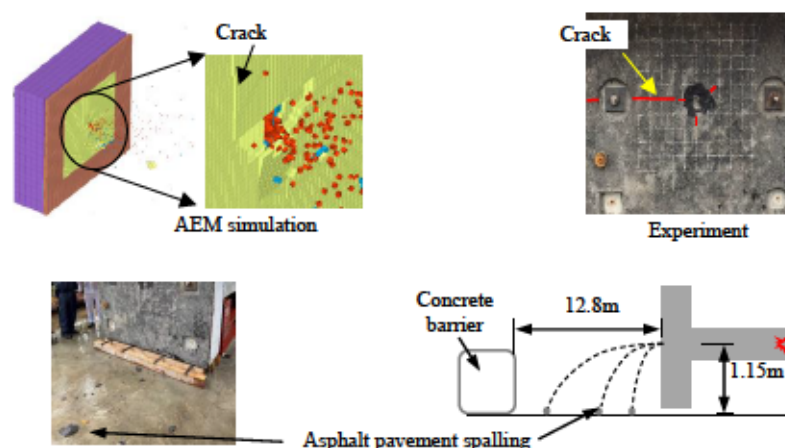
Guss asphalt pavement fracture and spalling of small pieces after rupture of the PC bar [10]
